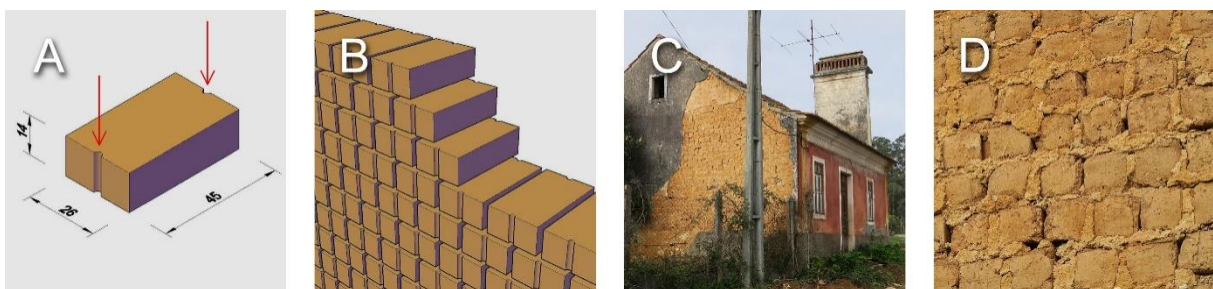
Leiria traditional adobe: A - schematic model of an adobe with side indentations; B - schematic model of an adobe masonry wall; C - inspected building 6 presenting adobe exterior walls; D – detail of a wall of the building mentioned in C
